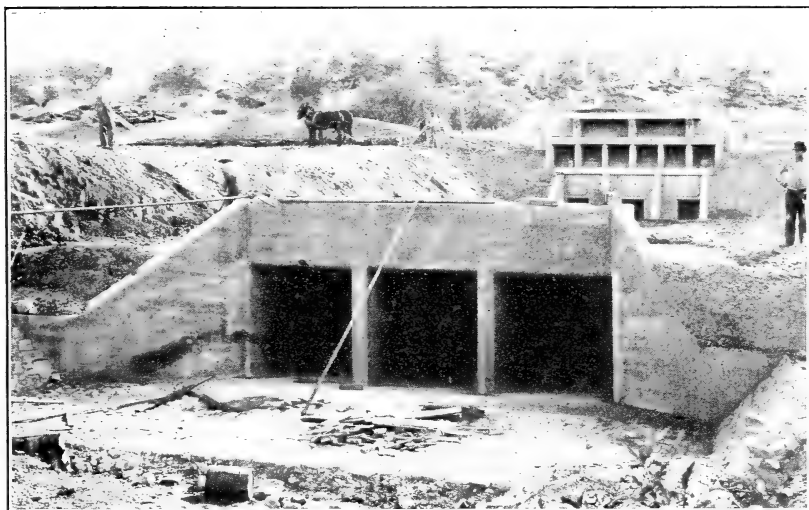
INTAKE END OF STORM CULVERT SHOWN IN FOREGROUND AND SIPHONS IN BACKGROUND.
